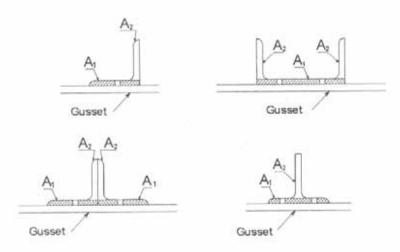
Single Angles, Channels and T-Sections Connected to Gusset Plates
